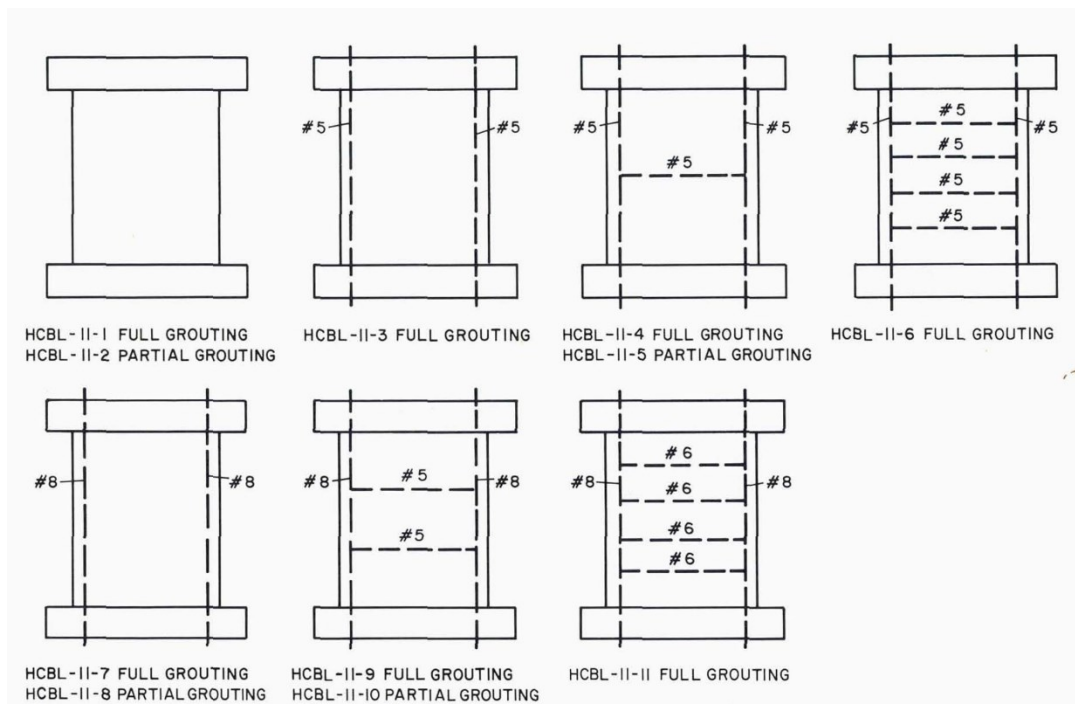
Single-Pier Specimen Reinforcing Details (Chen et al., 1978)
